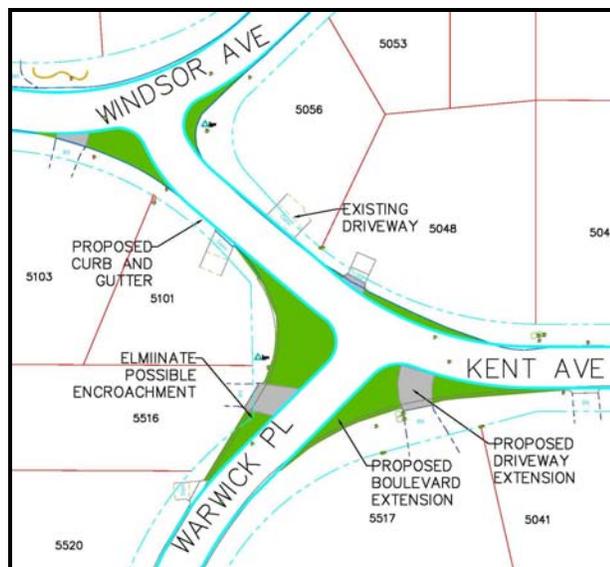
Proposed Geometric Configuration at Windsor Avenue/Kent Avenue Intersection and Kent Avenue/Warwick Place Intersection
